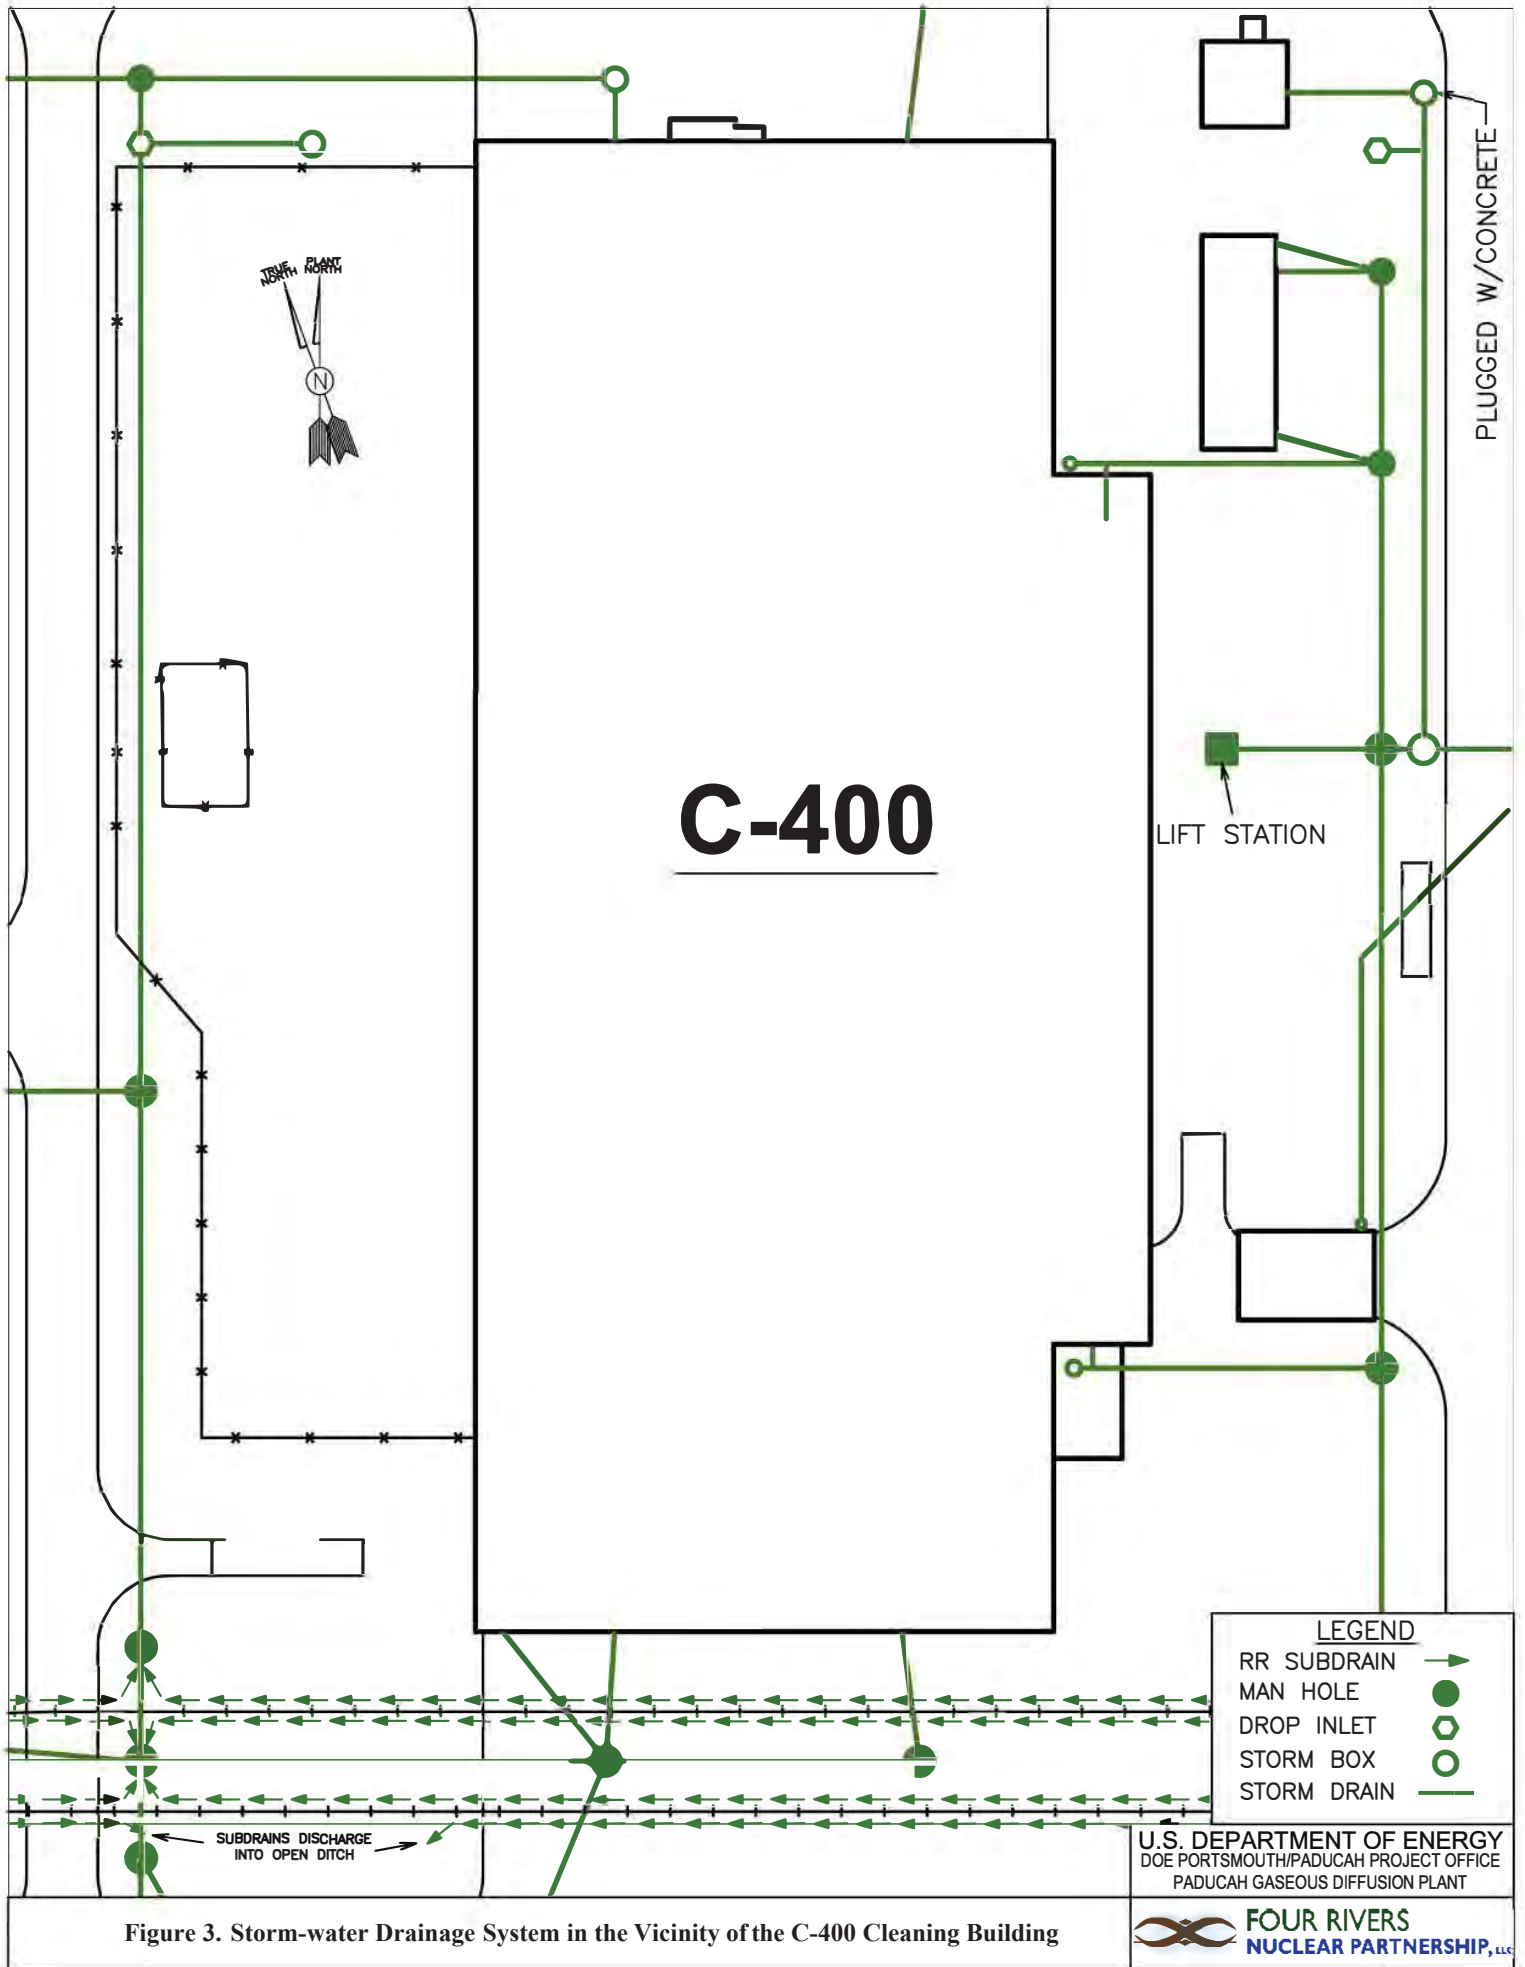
Storm-water Drainage System in the Vicinity of the C-400 Cleaning Building
